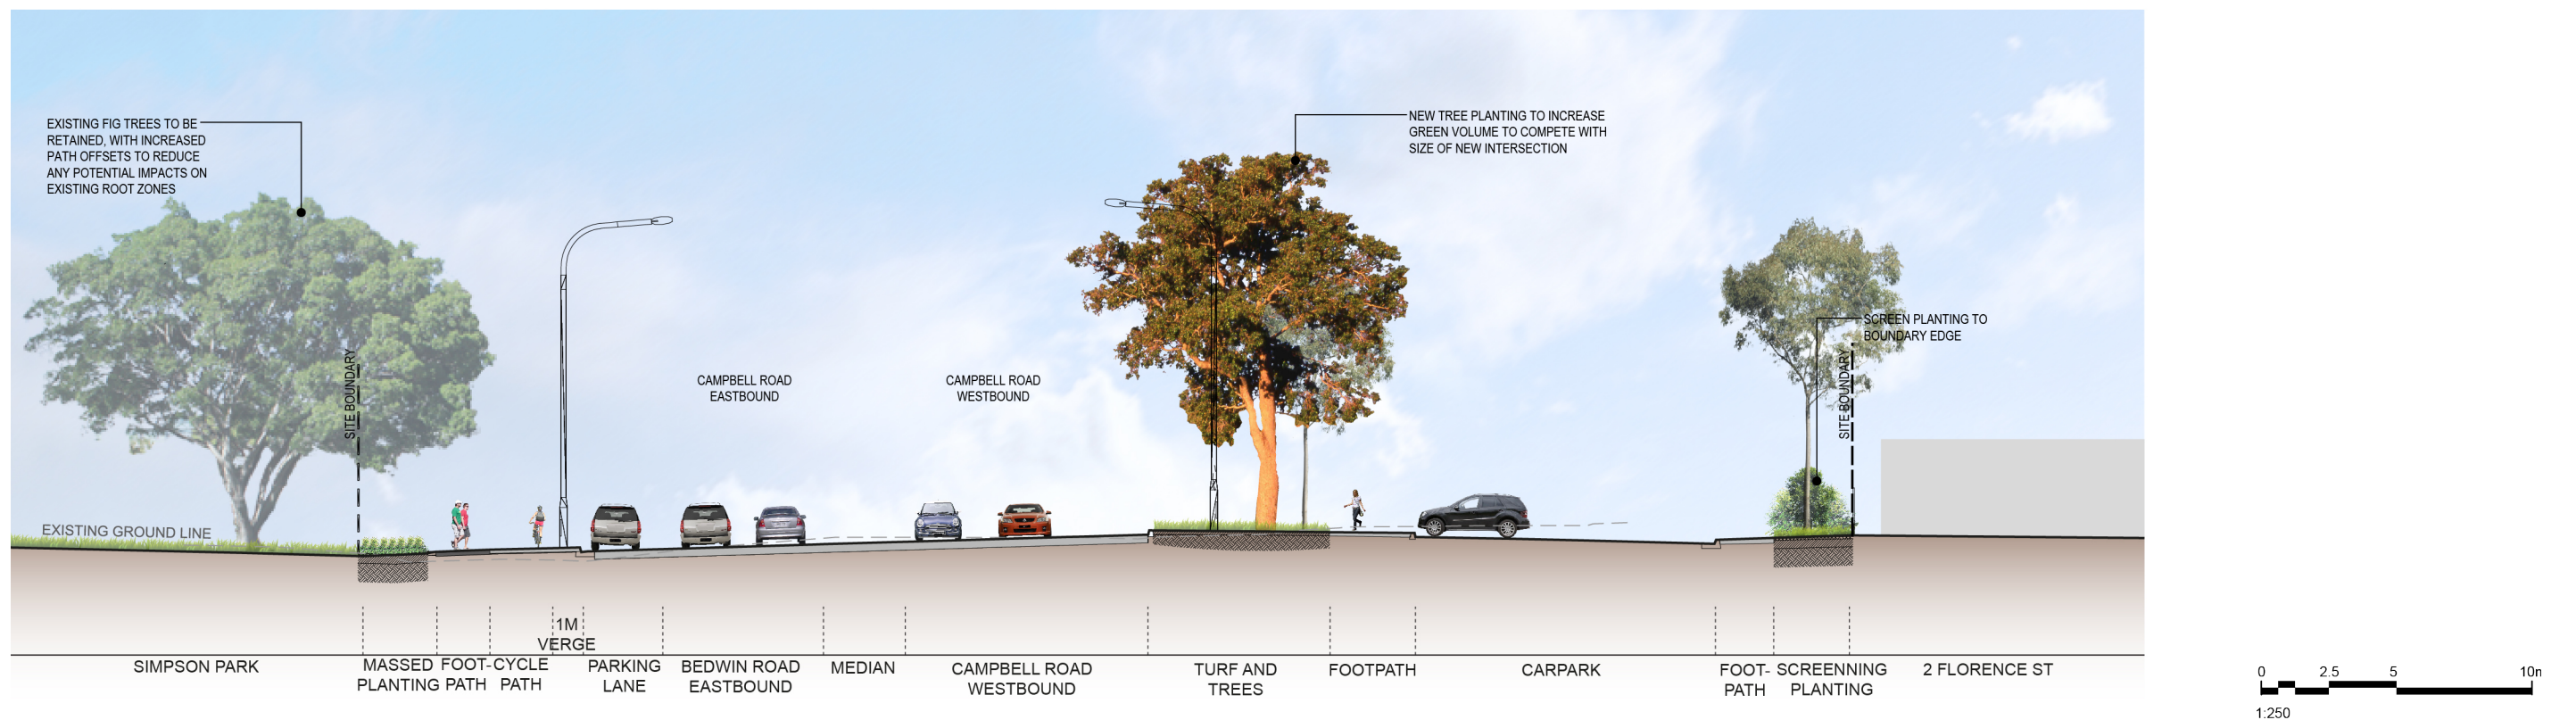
Typical Cross Section - Campbell Street and Simpson Park - 1:250
